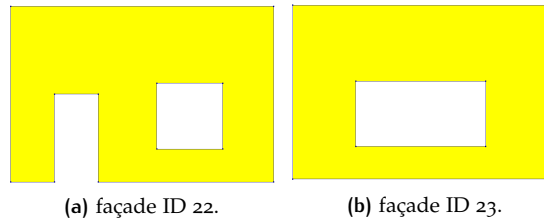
Geometry of a 6 m x 4 m façade exhibiting façade ID 22 and 23.
